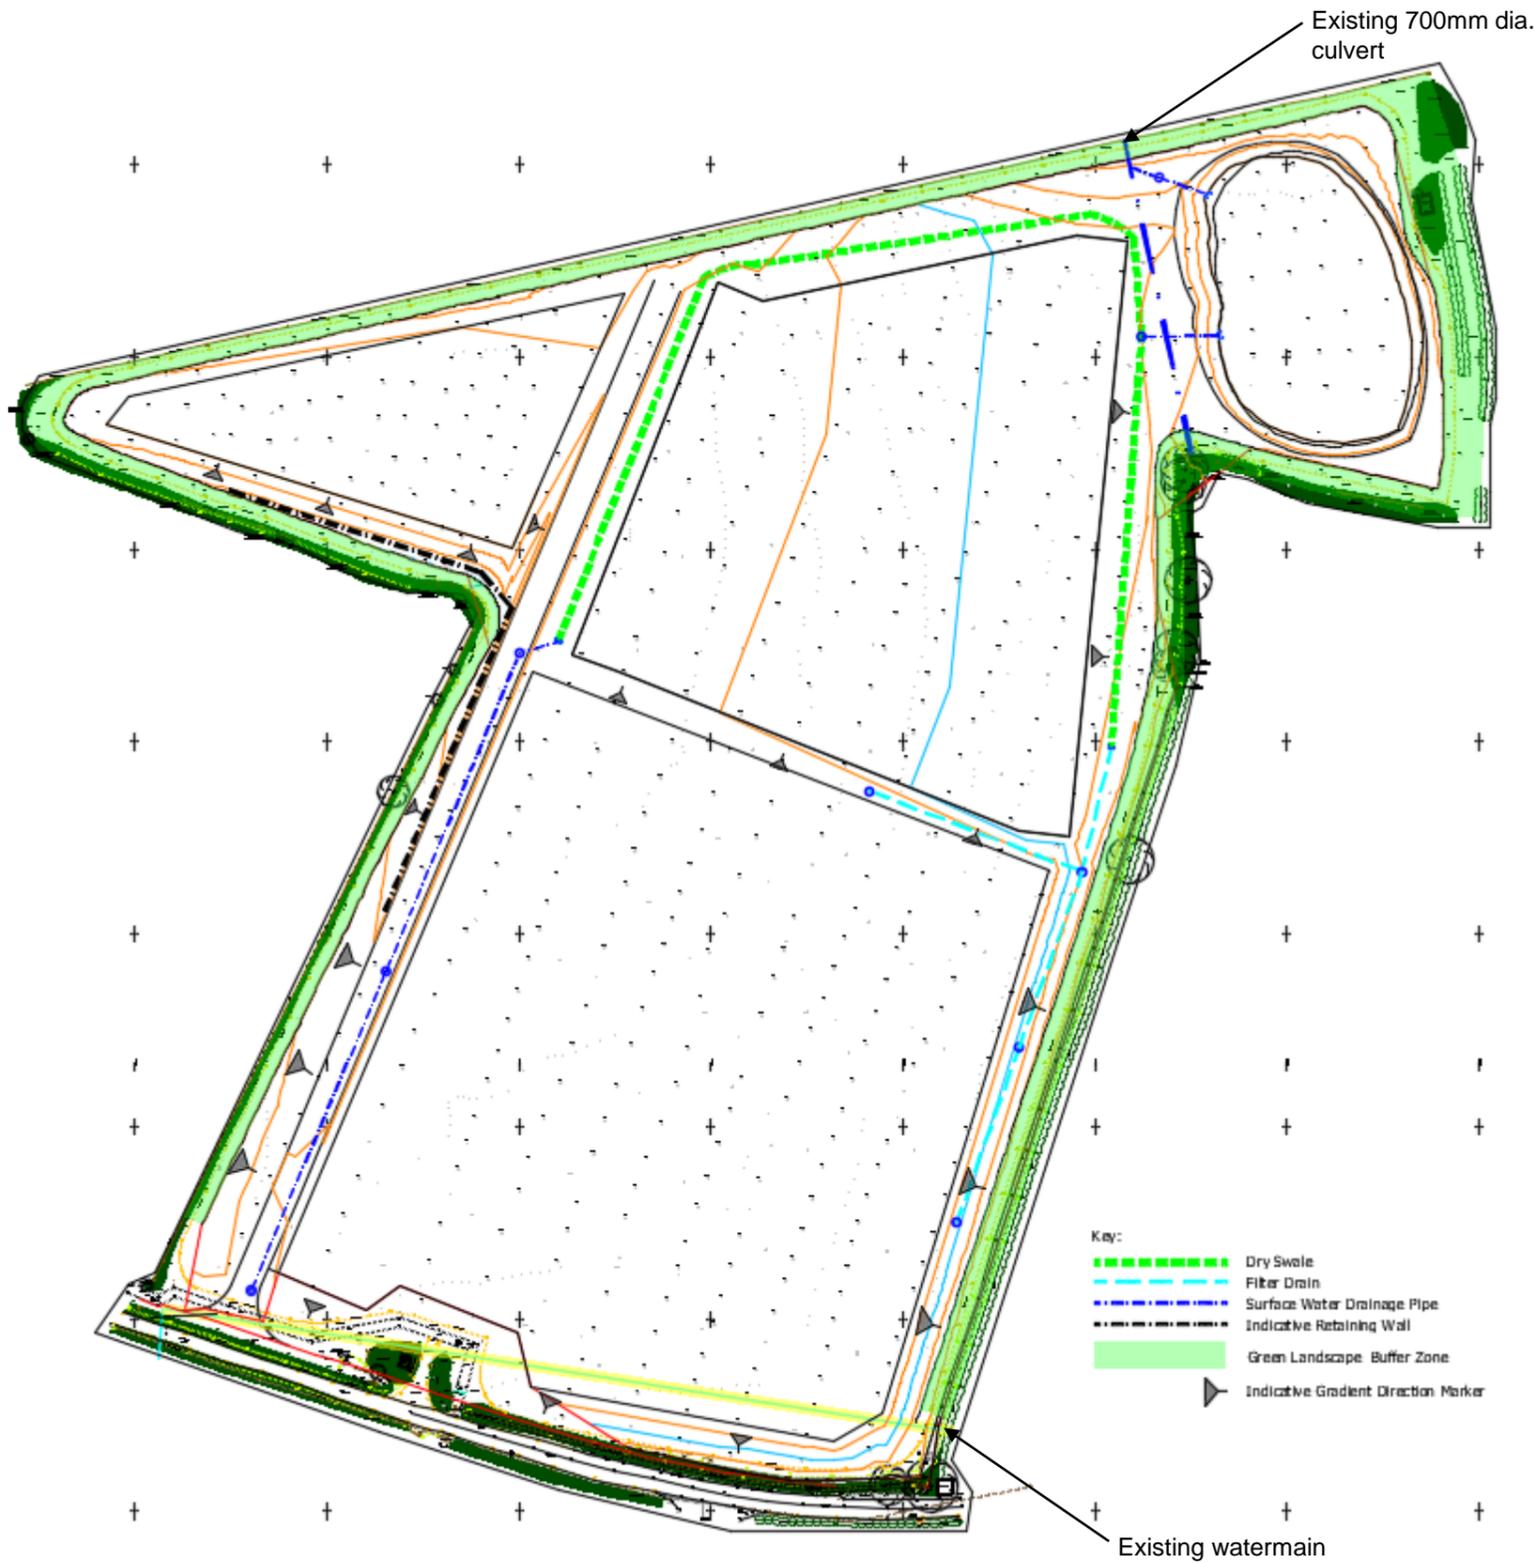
Outline Surface Water Drainage Plan (Not to Scale)
